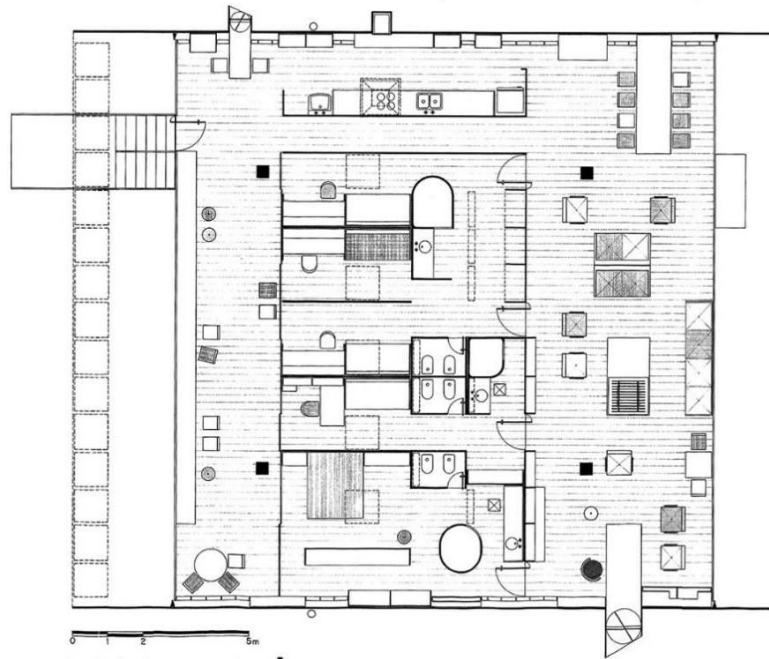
Butanta House Floor (Paulo Mendes da Rocha) AV Archive Arquitectura Viva
